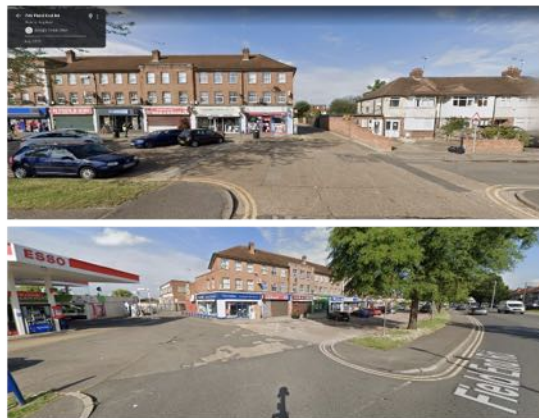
Access Road to Site coming from Jubilee Drive, showing existing trees along boundary
